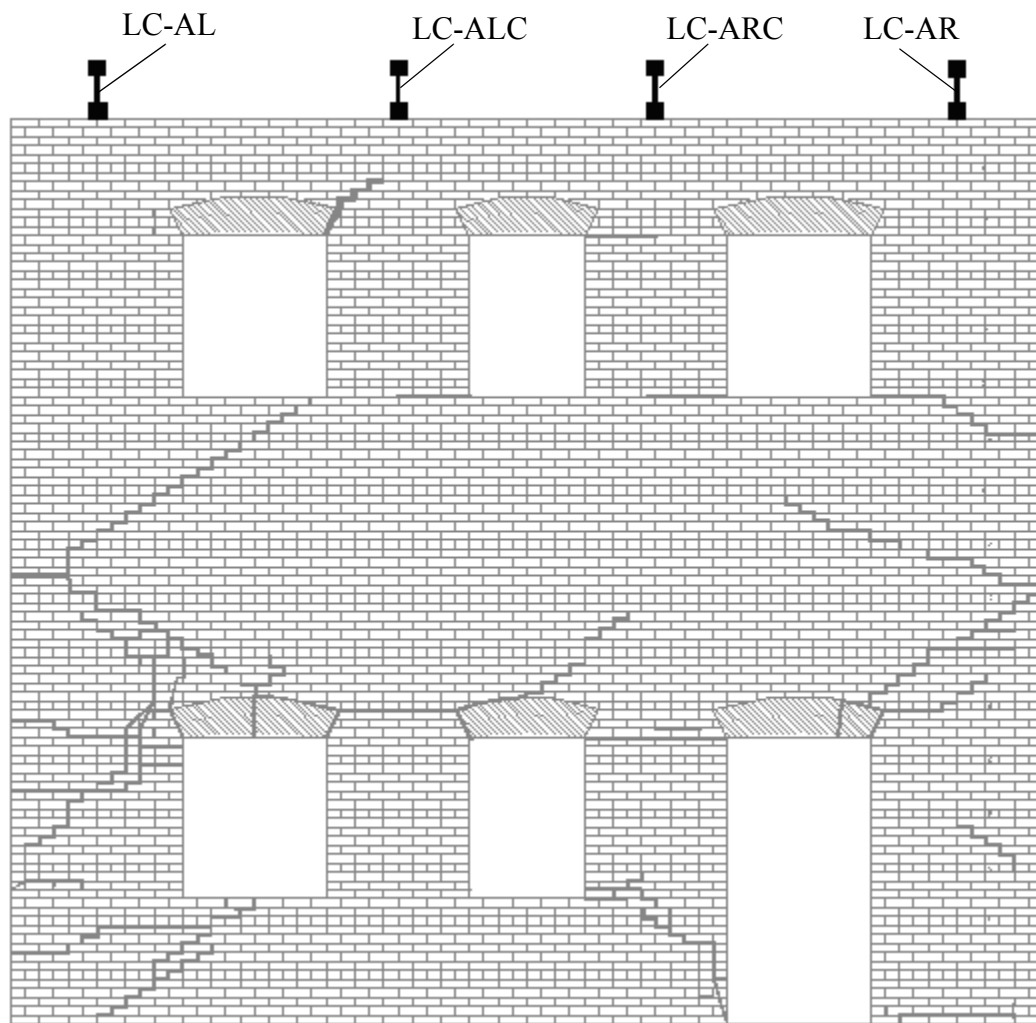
Elevation of Wall A illustrating the load cells on each post-tensioning tendon
